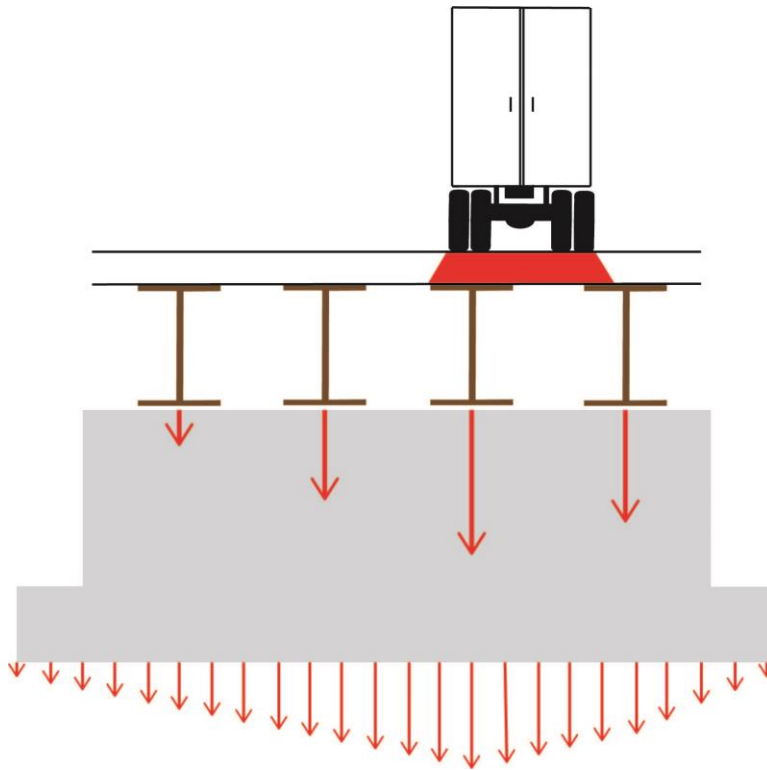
Bridge Cross-Section Illustrating Load Transfer
